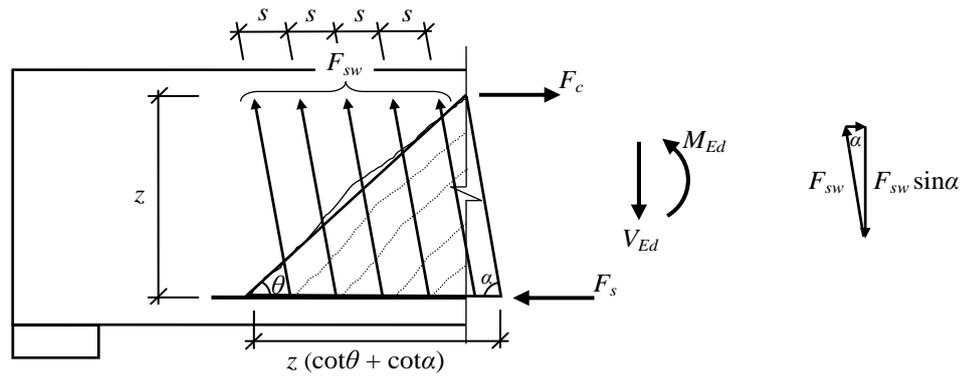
Truss model for derivation of the design value of shear force which can be lifted by inclined shear reinforcement.
